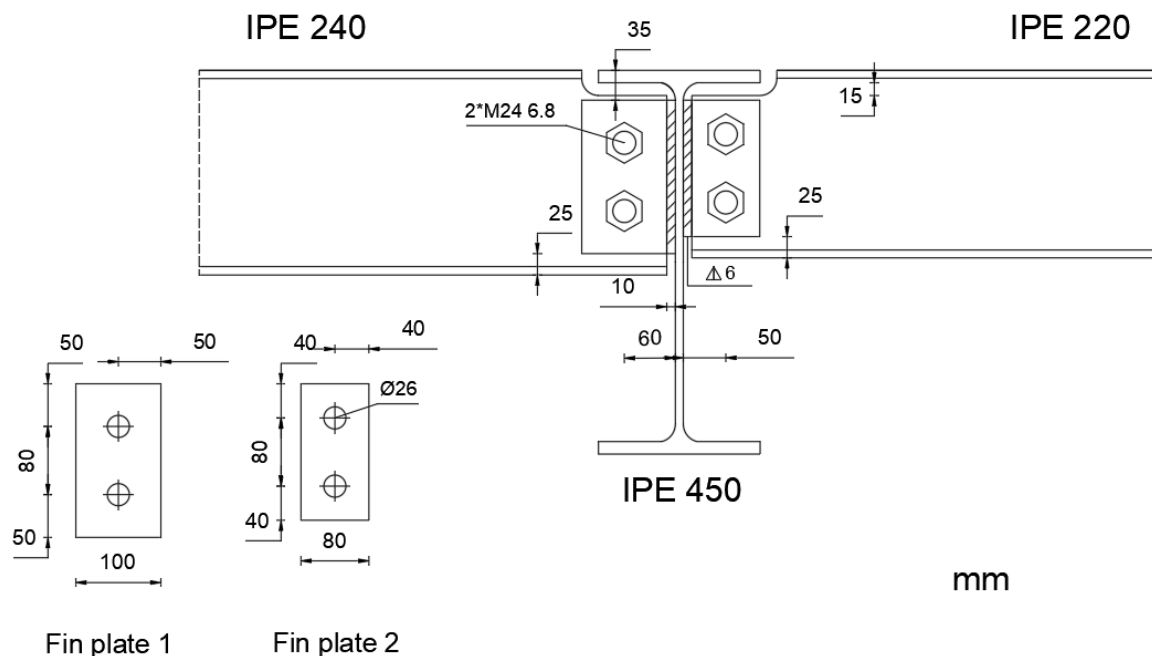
Single-notched fin plate connections designed for connecting the secondary beams IPE 240 and IPE220 with the girders
